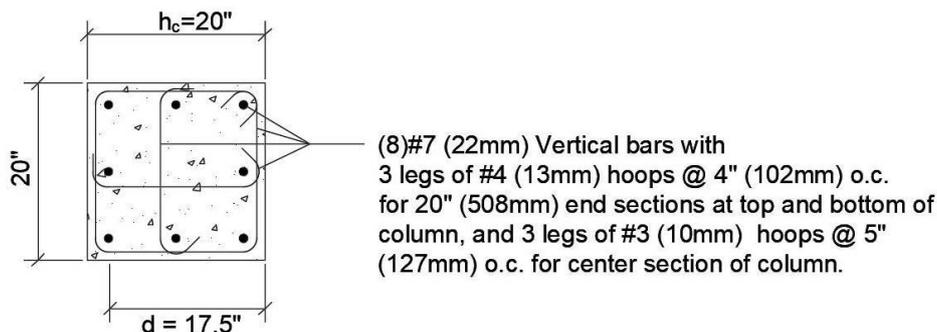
Original exterior gravity load column (1" = 25.4mm)
